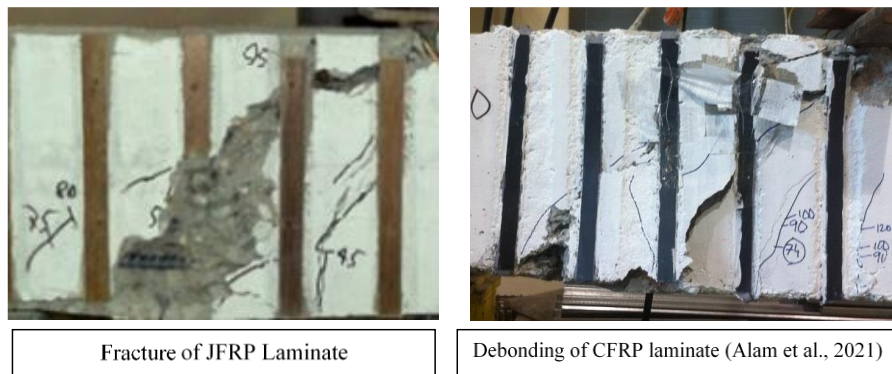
Failure modes of JFRP -and CFRP-laminate shear strips for maximum shear enhancement of beams
